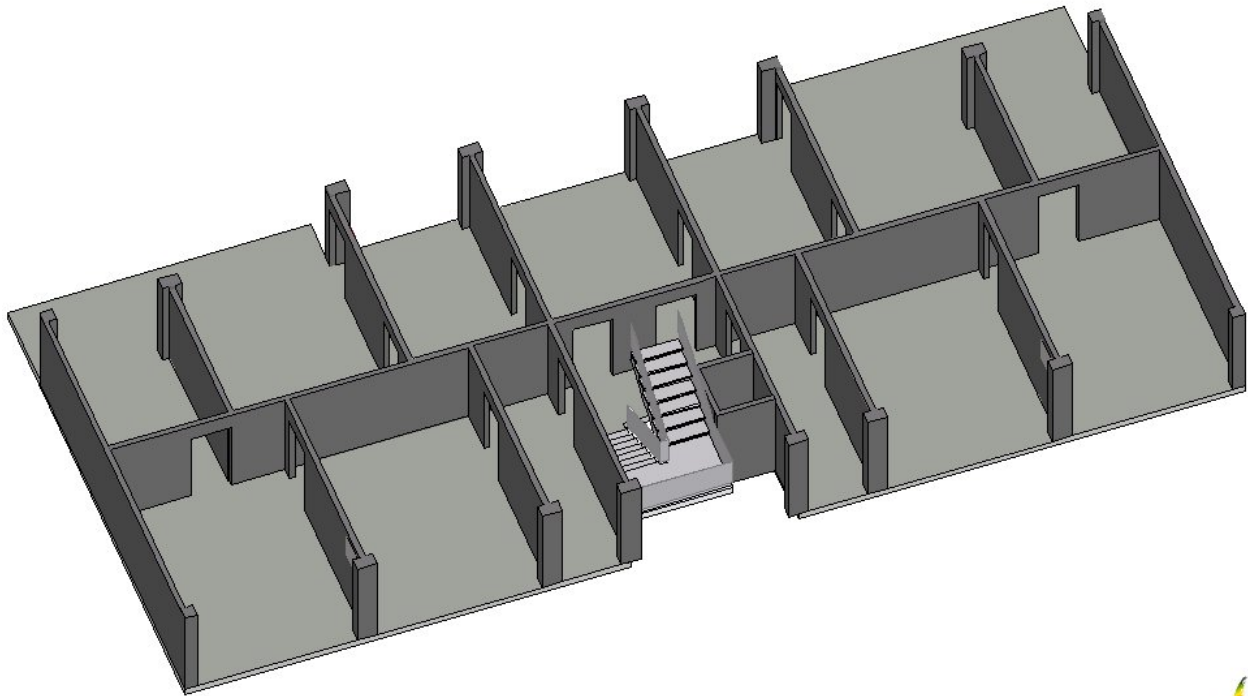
A: Key Seismic Features - Shear Wall Layout (note only one shear wall in the longitudinal direction)
